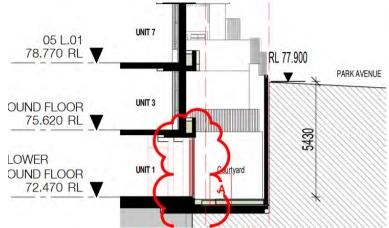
Proposed Section through Bedroom 2 or Unit 1
